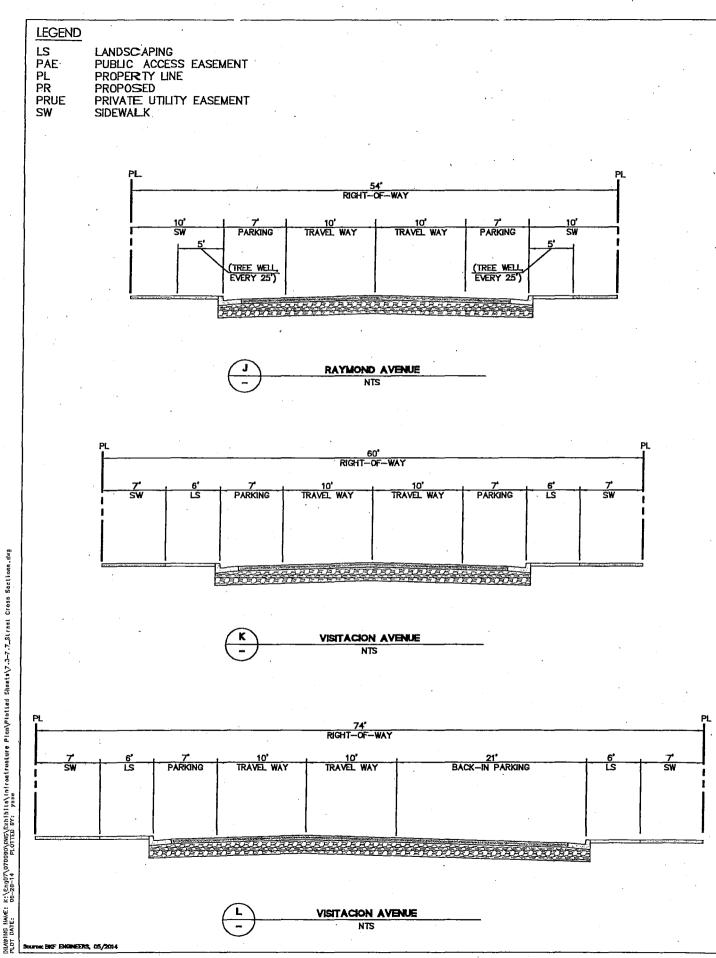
TYPICAL STREET CROSS SECTIONS
